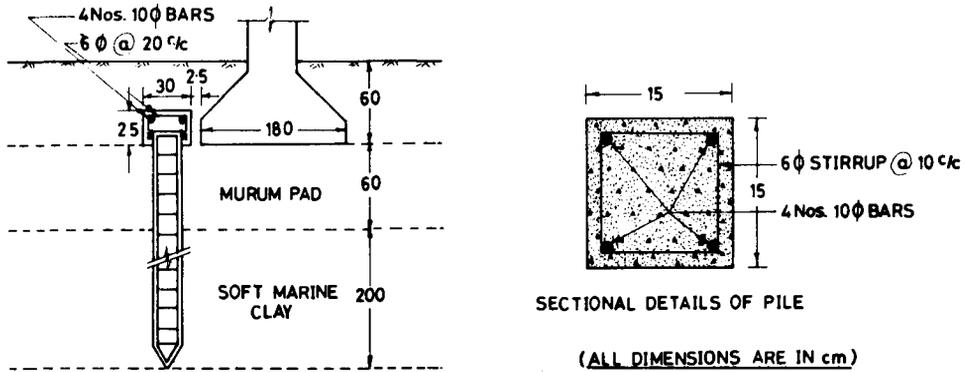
(b): SECTION-AB SHOWING THE DETAILS OF THE SKIRTING EDGE BEAM AND THE FOOTING
